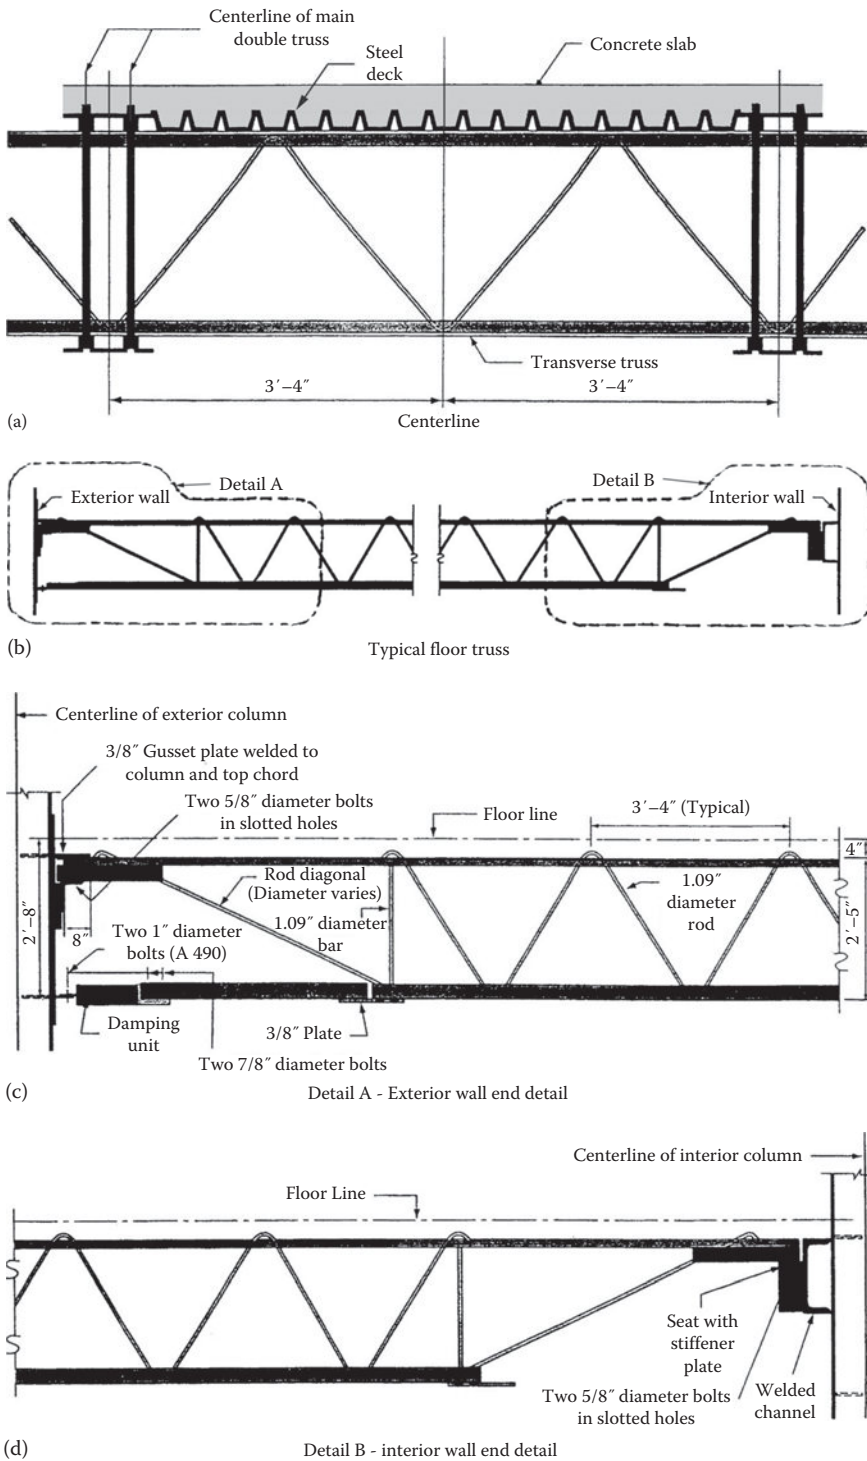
WTC floor construction. (a) Metal desk and truss detail; (b) truss attachment to exterior and interior walls; (c) exterior end wall detail; (d) interior end wall detail.
